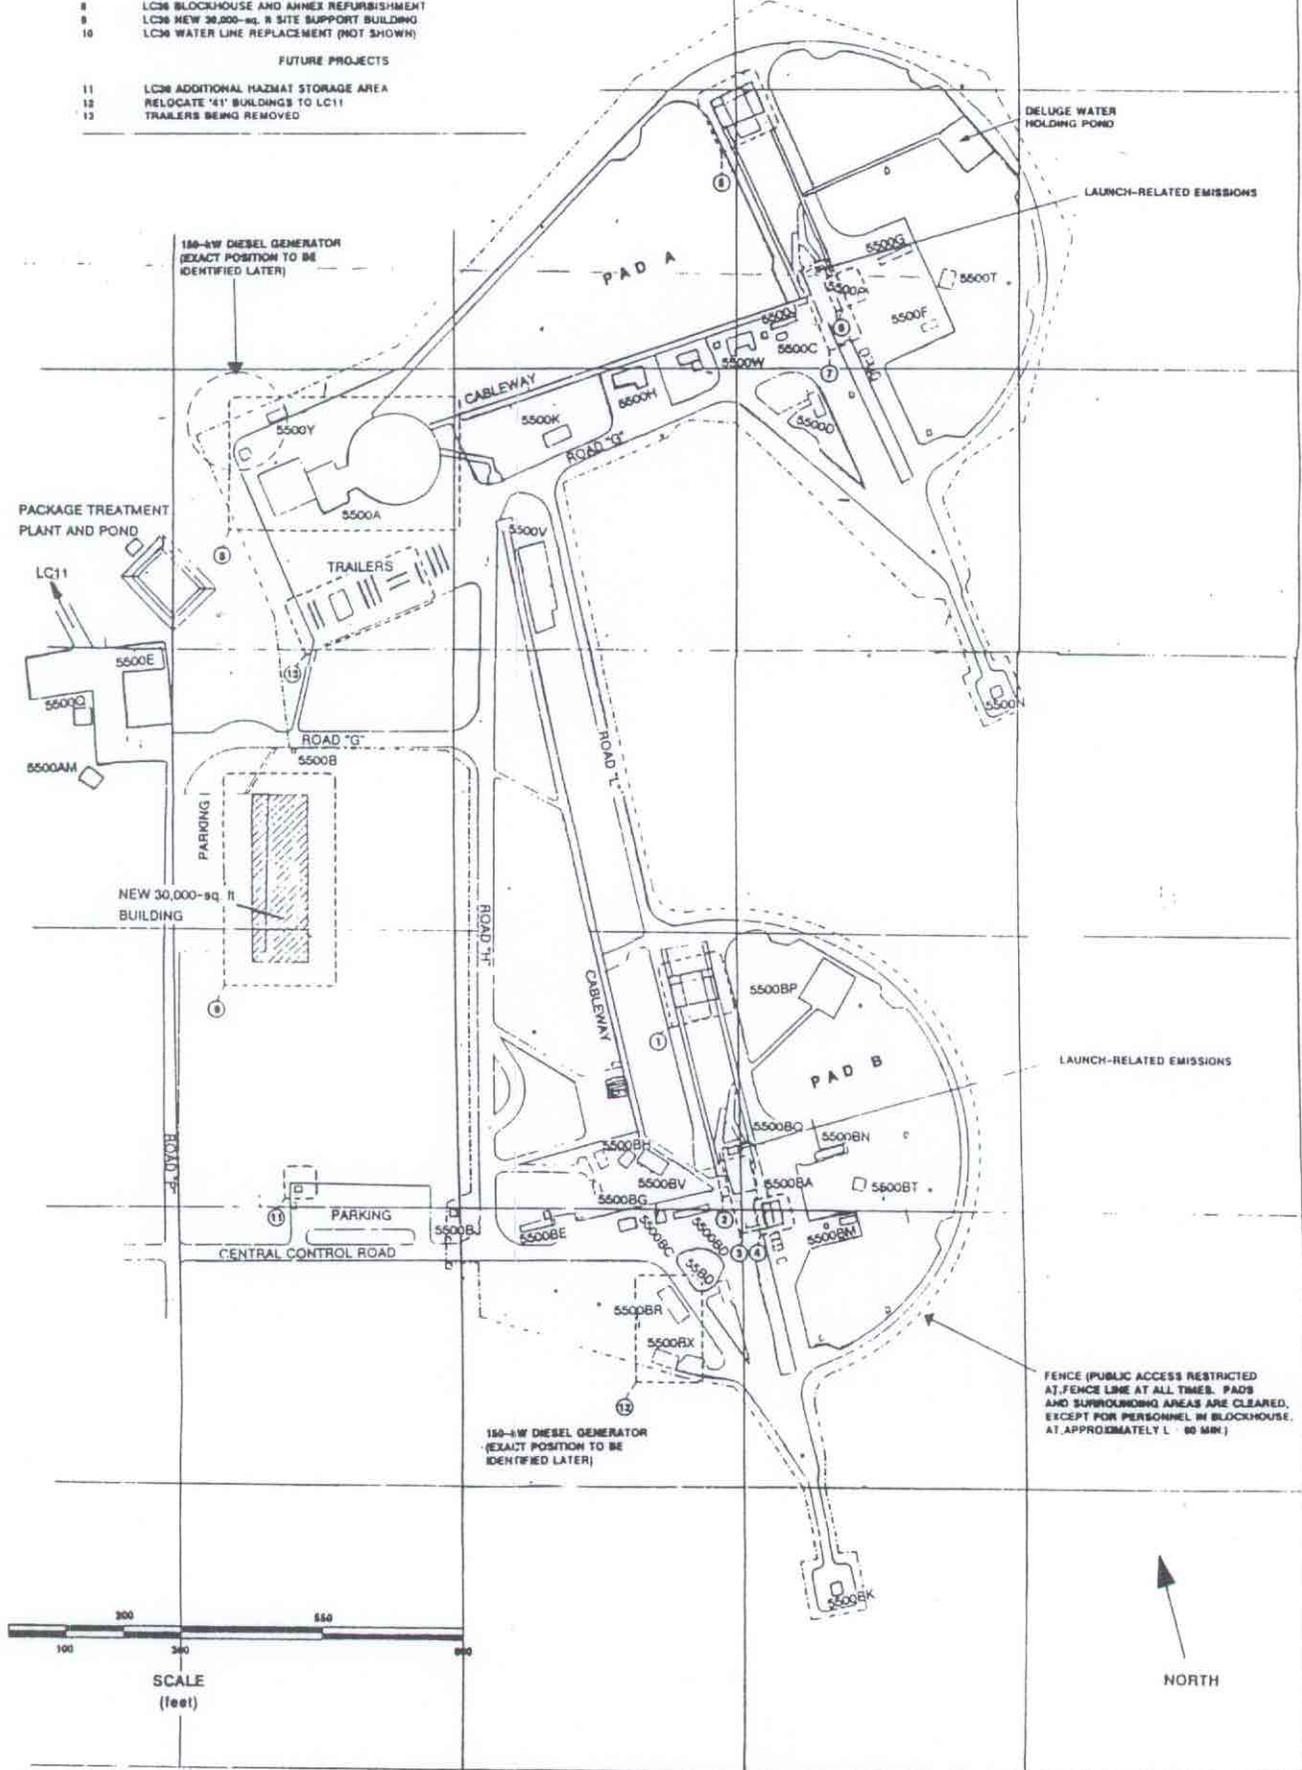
Location of renovation and construction projects at LC36 at CCAFS as planned for
